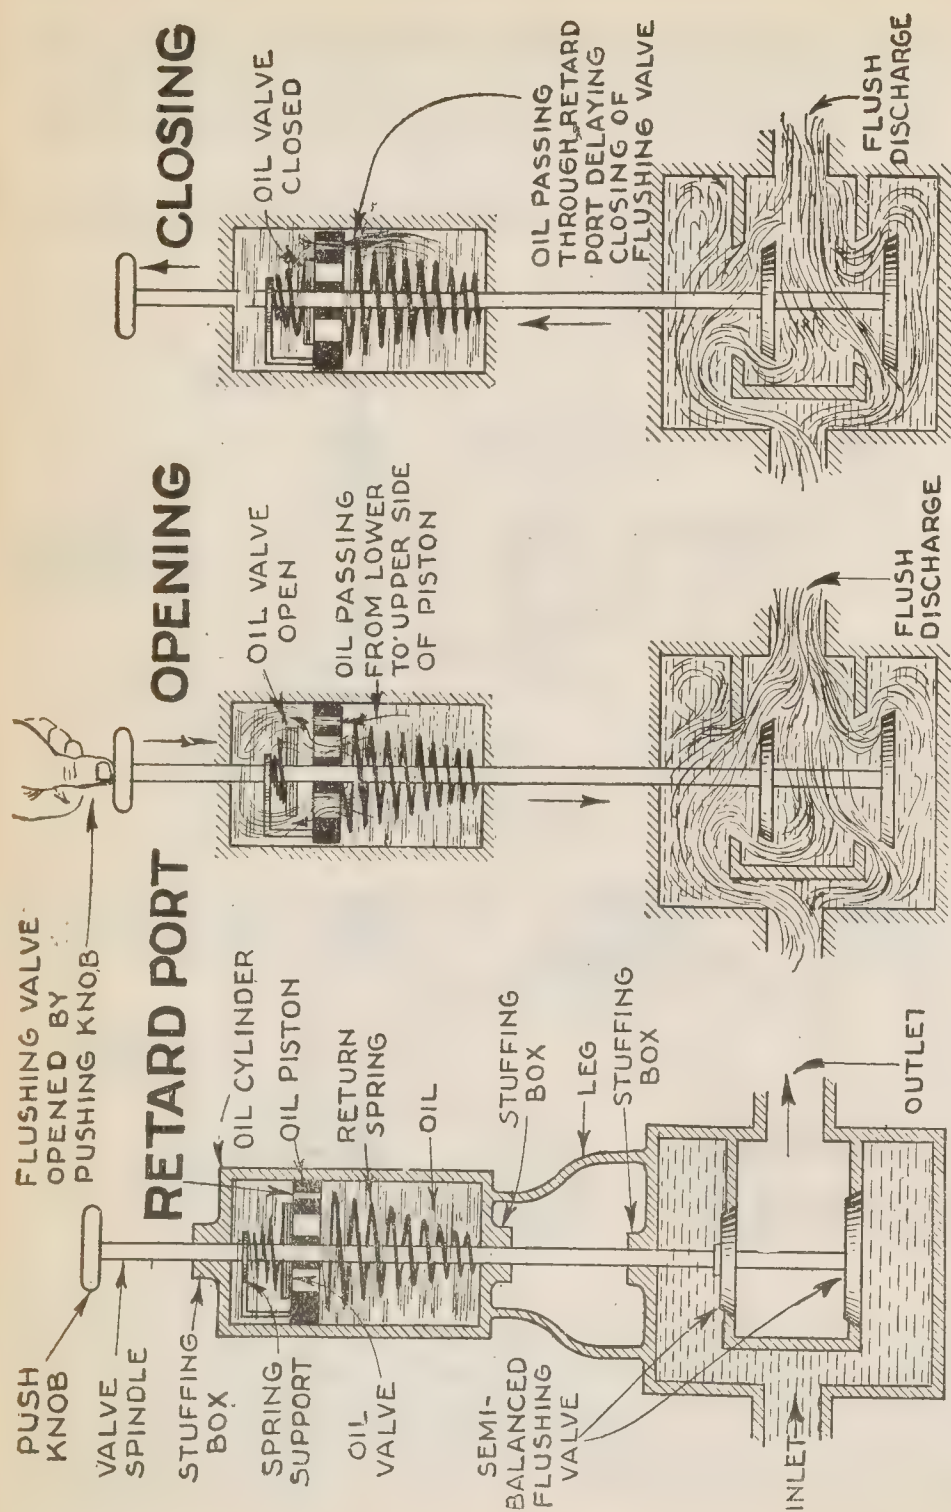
,206.—Elementary oil retarded flushing valve showing essential features.
